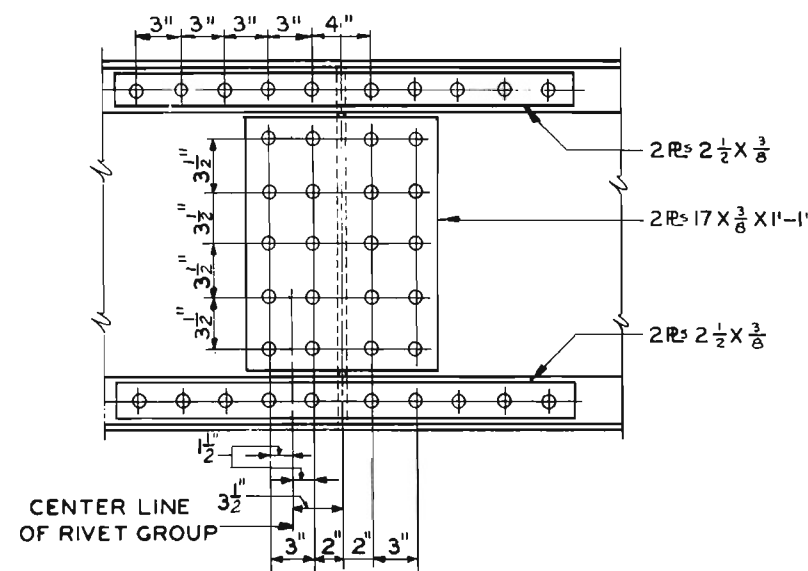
Riveted web splice of plate girder equivalent to 21-inch 63-pound rolled beam.
